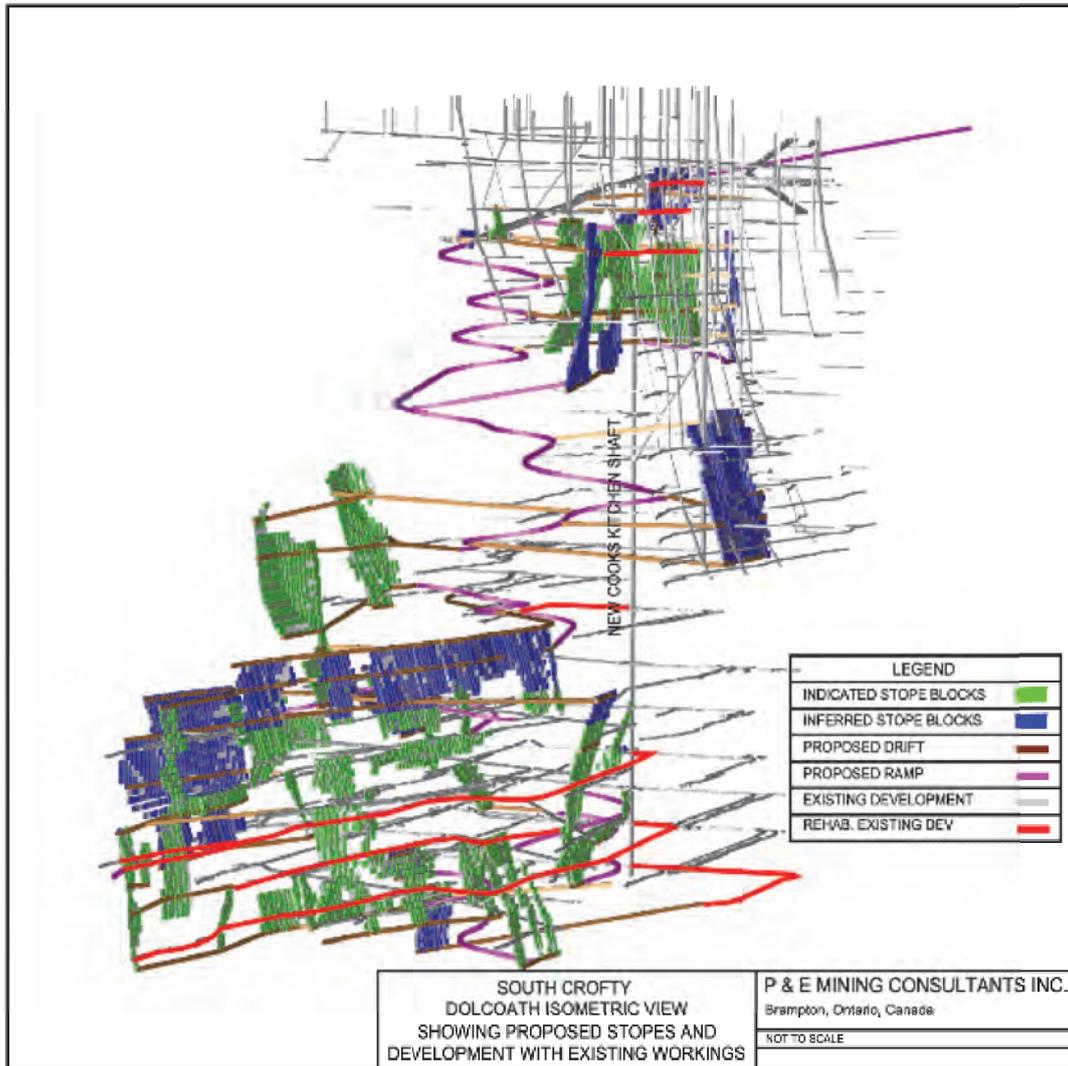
Isometric View of the South Crofty-Dolcoath Section Underground Mine Layout
